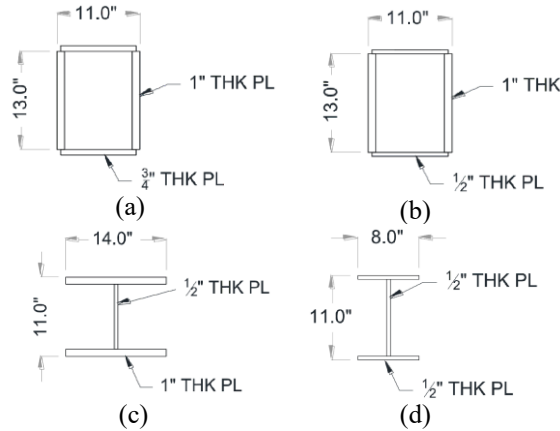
Cross-section of the truss members (a) east and west chord, (b) compression diagonal, (c) tension diagonal and (d) vertical member (Mentes 2011)
